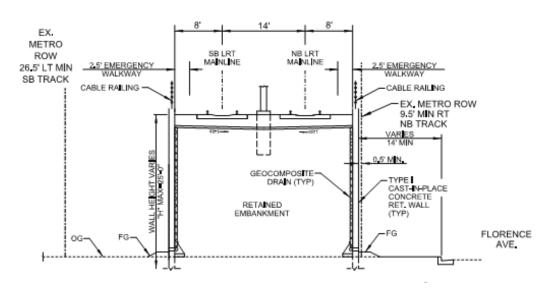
Alternative 1A – Preliminary Retained Fill Section
